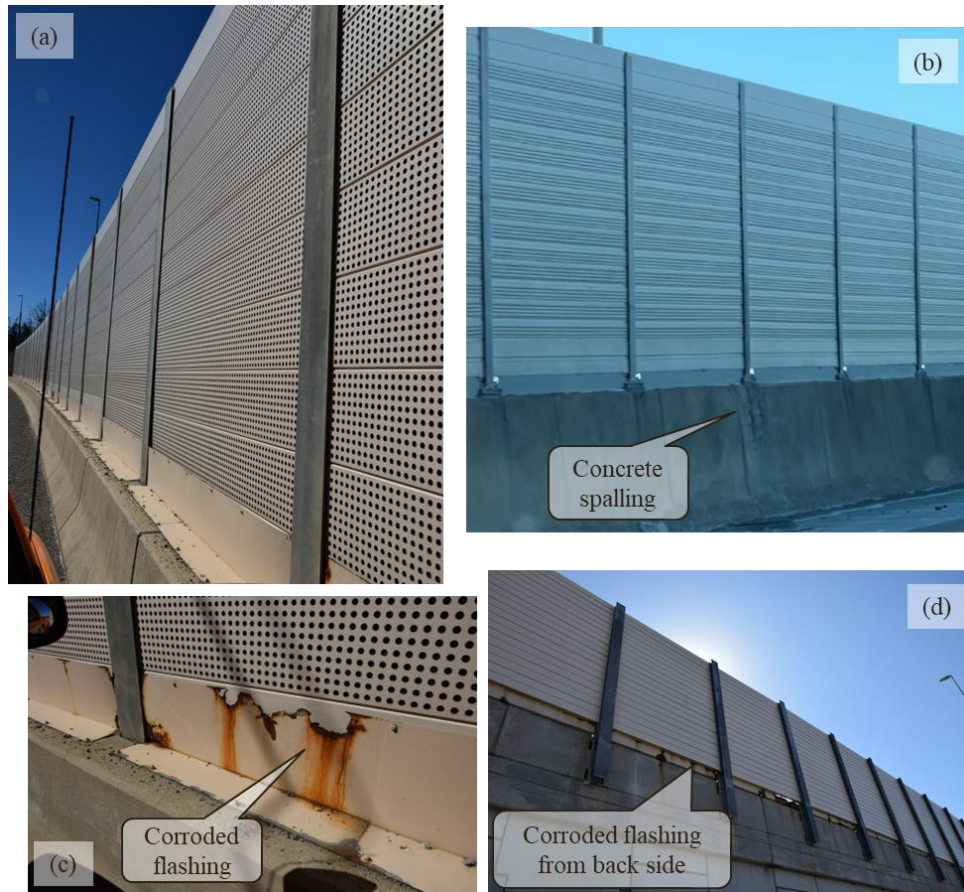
Photos of the Condition of Noise Barriers Constructed with Polyvinyl Chloride Panels: (a) Overall View of Barrier; (b) Concrete Spalling in Concrete Barrier at Post Connections; (c) Corroded Flashing at Panel Base; (d) Back Side of Noise Barrier Showing Post Connections and Corroded Flashing
